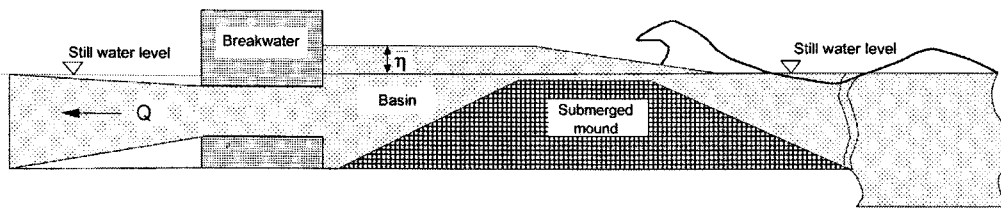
Sketch of tunneled breakwater with submerged mound.
